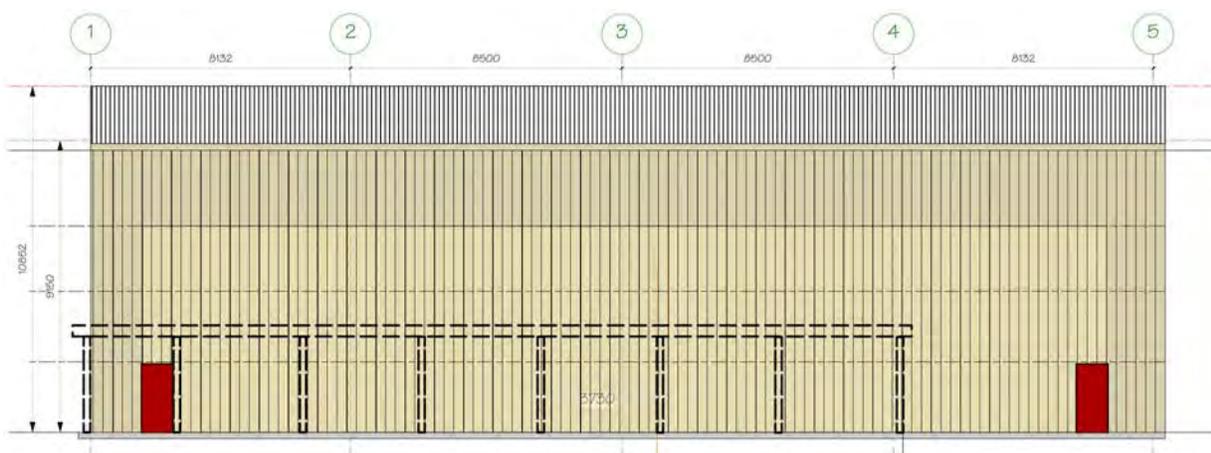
East Elevation (from plans by Praxis Architects Inc.)
